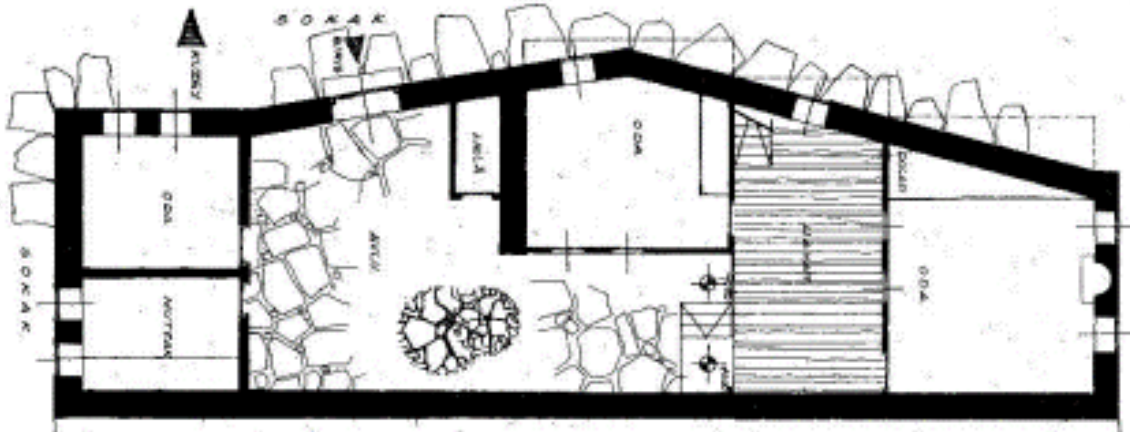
Bekir Beyler House Ground Floor Plan (Tosun, 1969)
